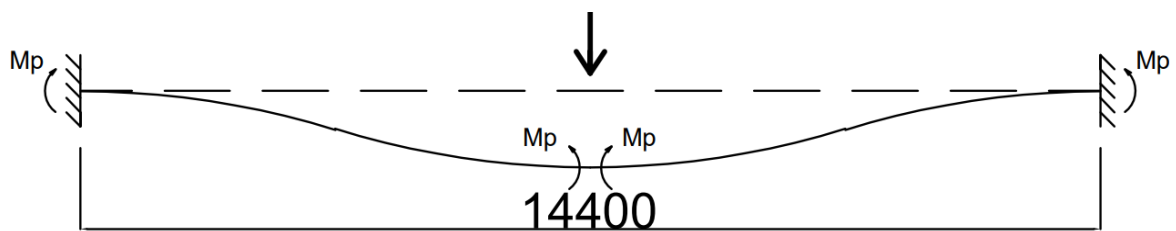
Interior or facade column removed, single span beams supported by rigid connections
